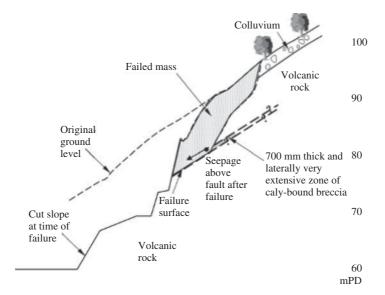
View of large rock slope failure in 1982, South Bay Close, Hong Kong.
